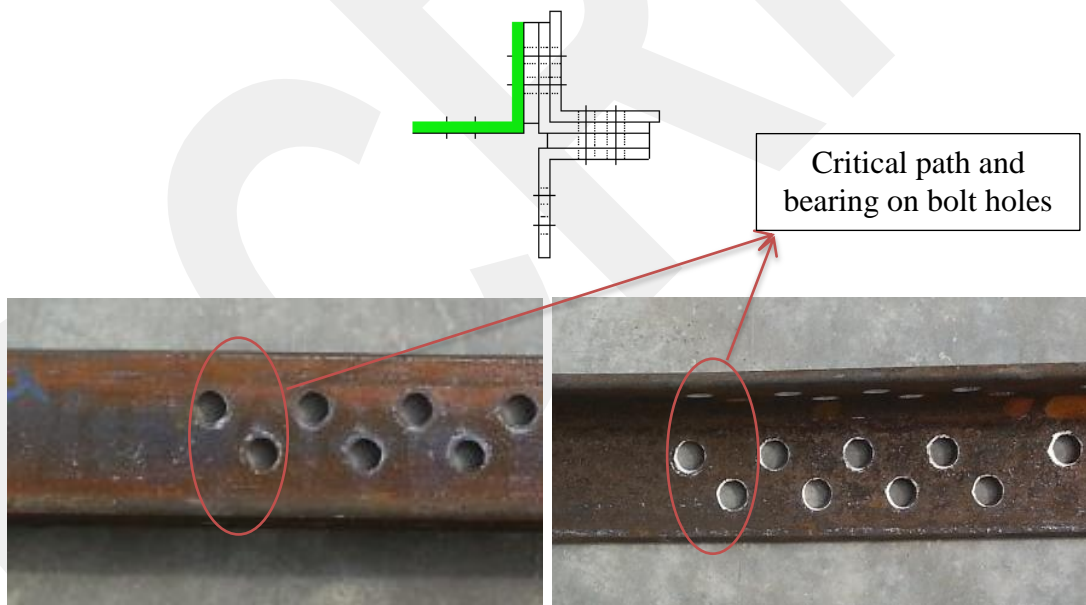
Bearing on lower main member 1 (Specimen-4)
